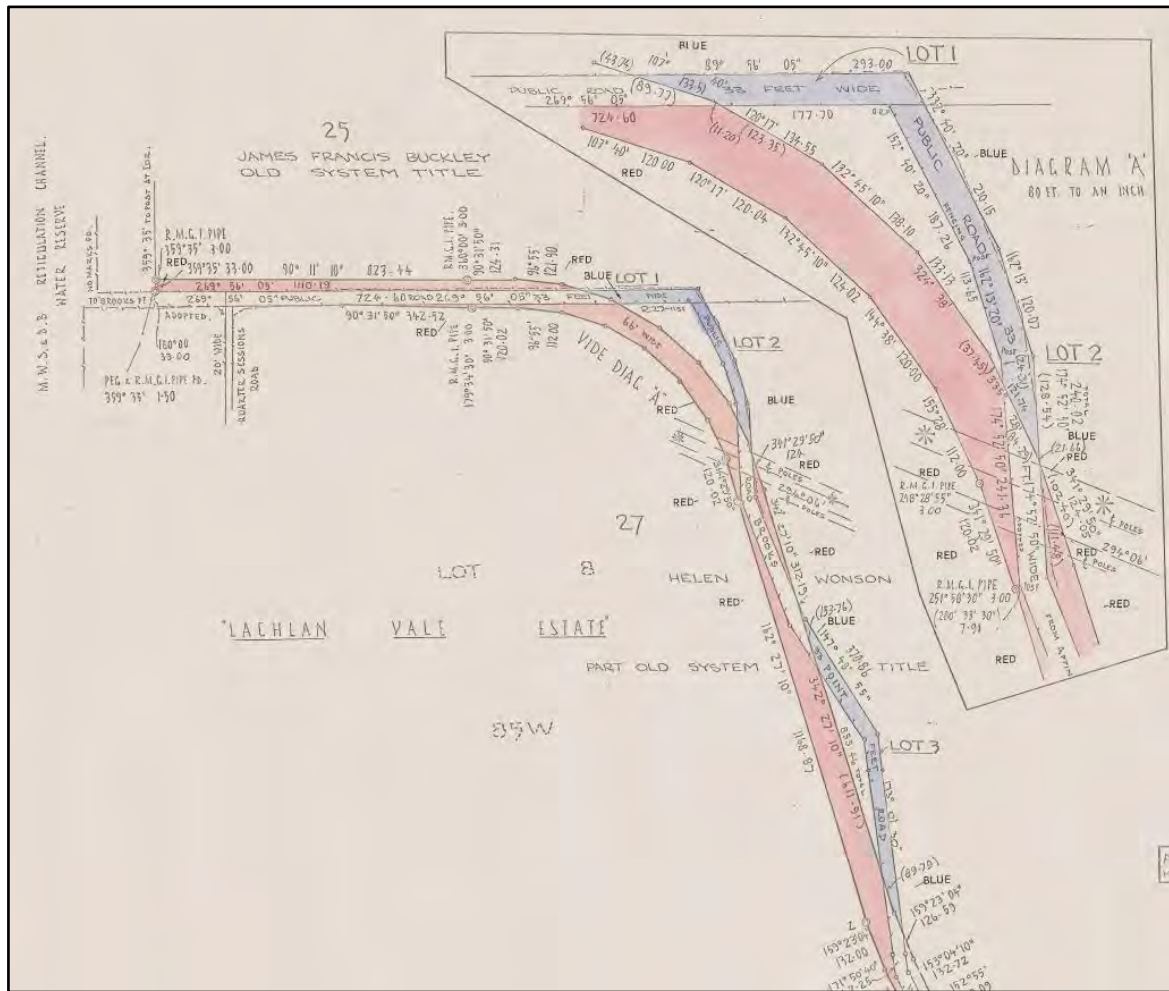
A section of the plan of the proposed road marked in red in 1974 (LPI R34224.1603).
